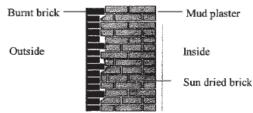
A Typical Wall Section of a Traditional Building Source: Upadhyay, 2006
